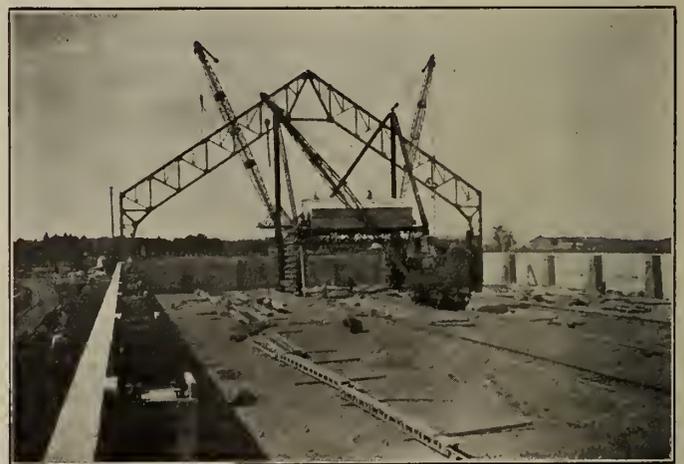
Erection of Steelwork for Coke Storage Building.
